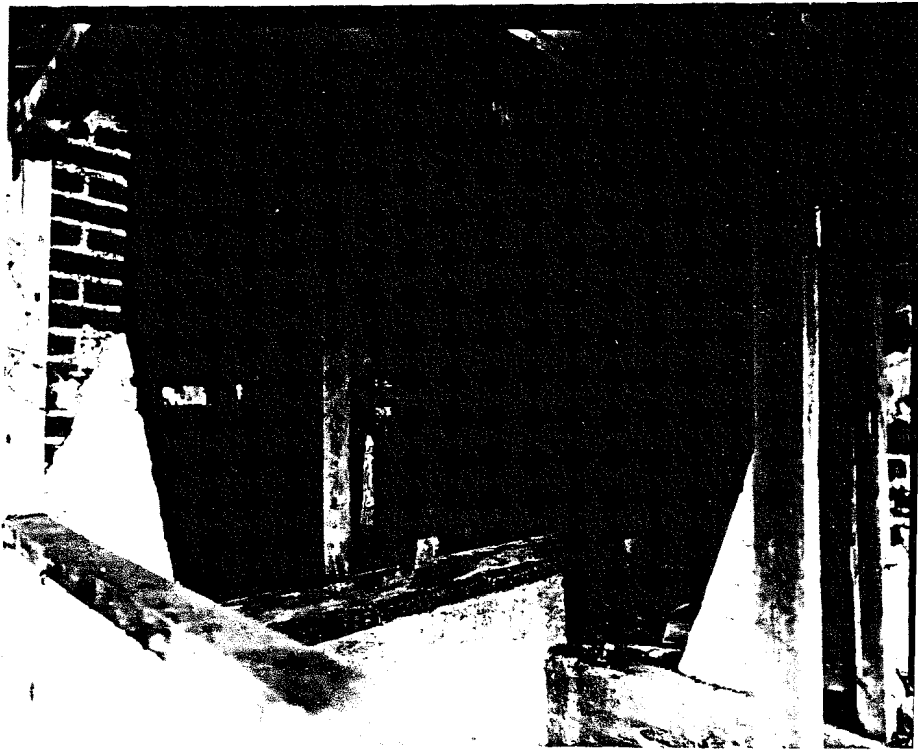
DUCK CREEK MILL, TURBINE HOUSING
